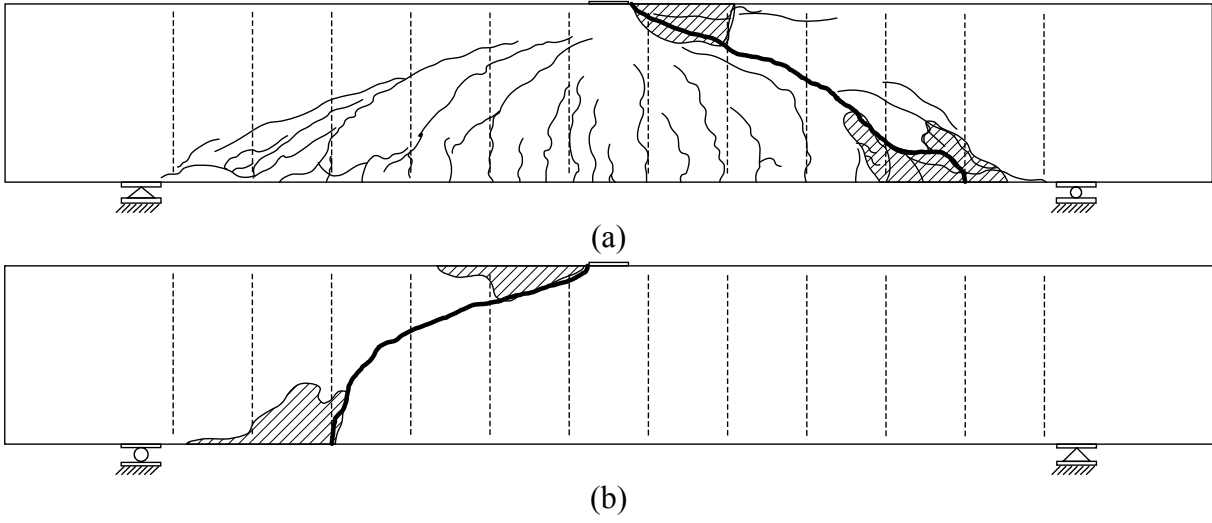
Observed damage in specimen P1S8, (a) front side, (b) back side
